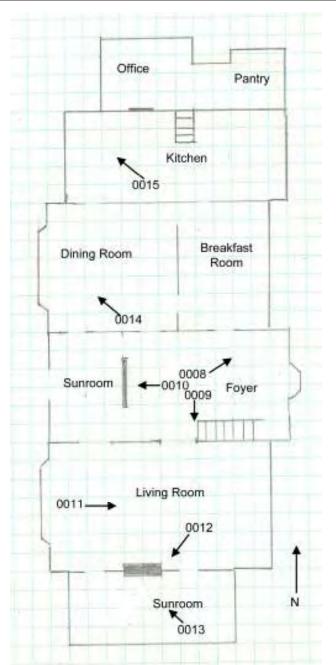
Floor plan of first story with photograph locations. (Susan Jezak Ford, not to scale.)
